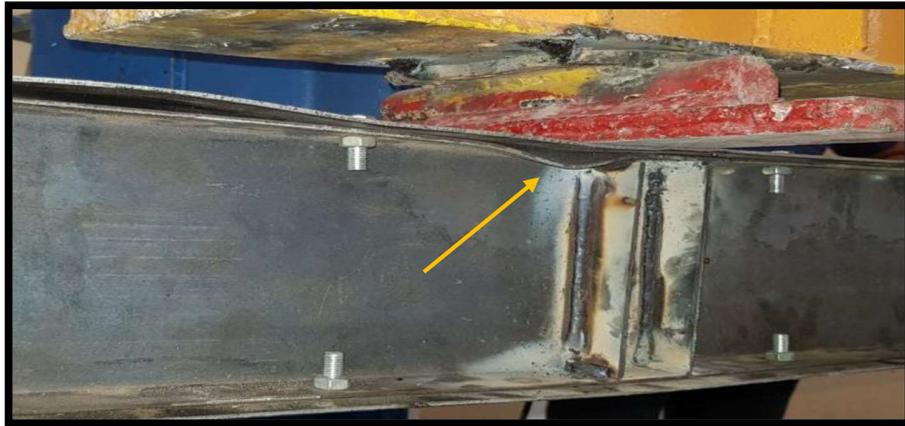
Shows the failure that occurs at specimen CF100L.
